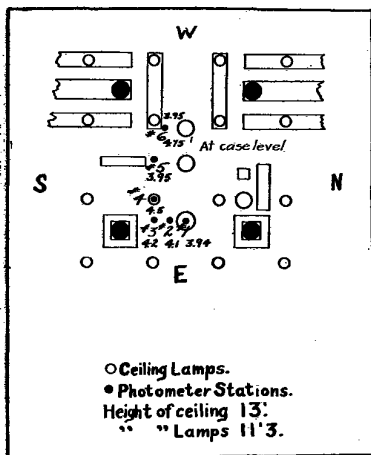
Section plan of fifth floor, (kitchen utensils), showing location of furniture, pillars, lighting units, test stations and illumination data.
